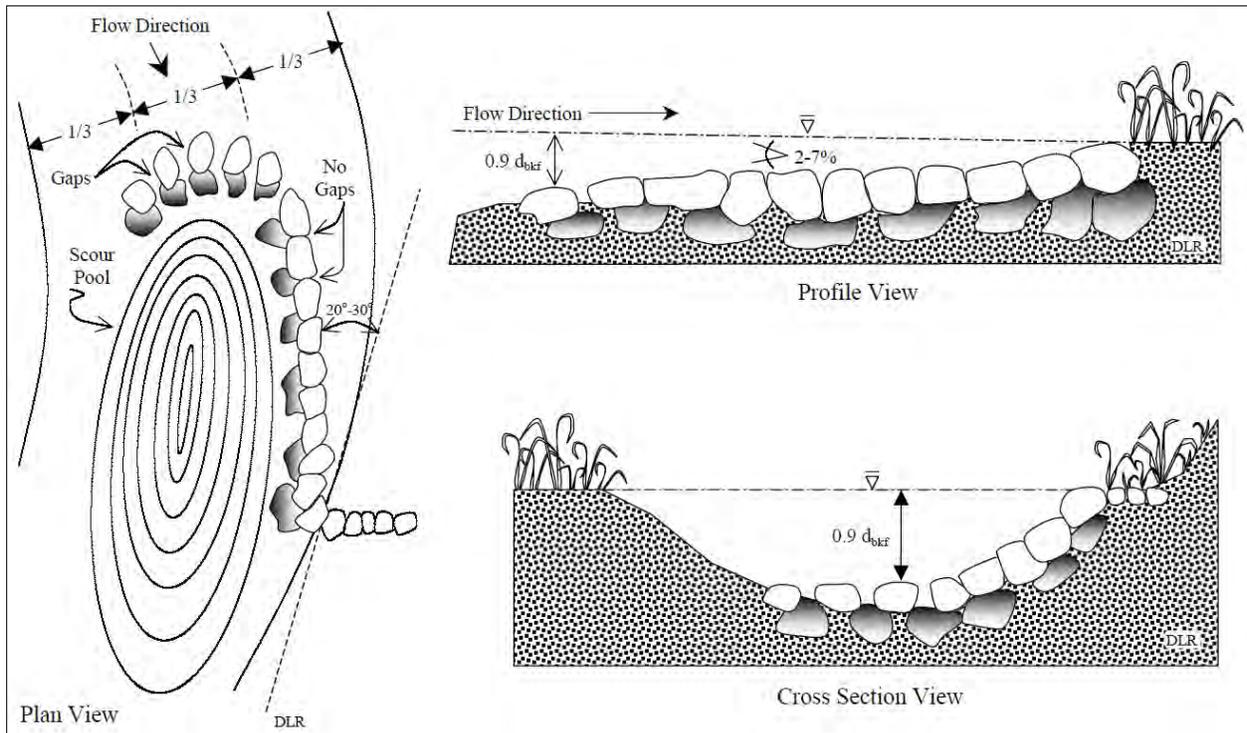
Generic J-Hook Vane Plan, Profile, and Cross-Sectional View Detail
